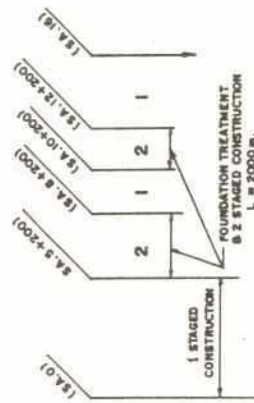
(1) STAGED CONSTRUCTION OF EMBANKMENT : GREATER DHAKA EAST
